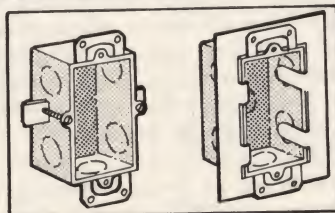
BOXES AND HOLDER FOR "OLD WORK"
